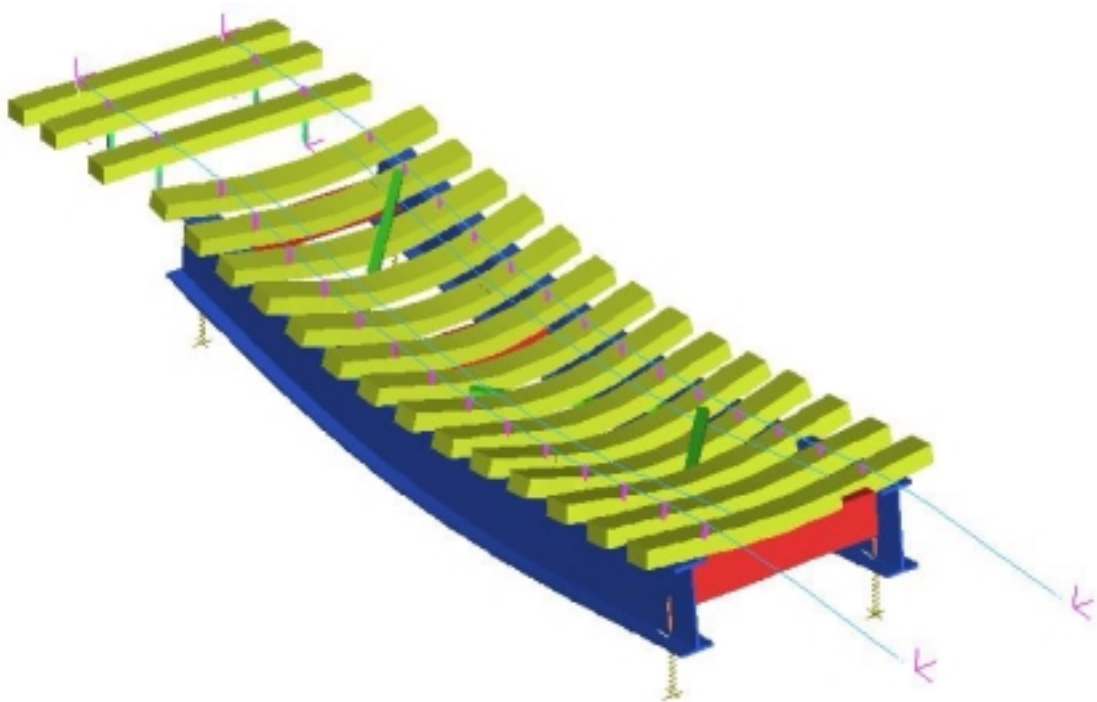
Rendered approach span beam element sensitivity model.
